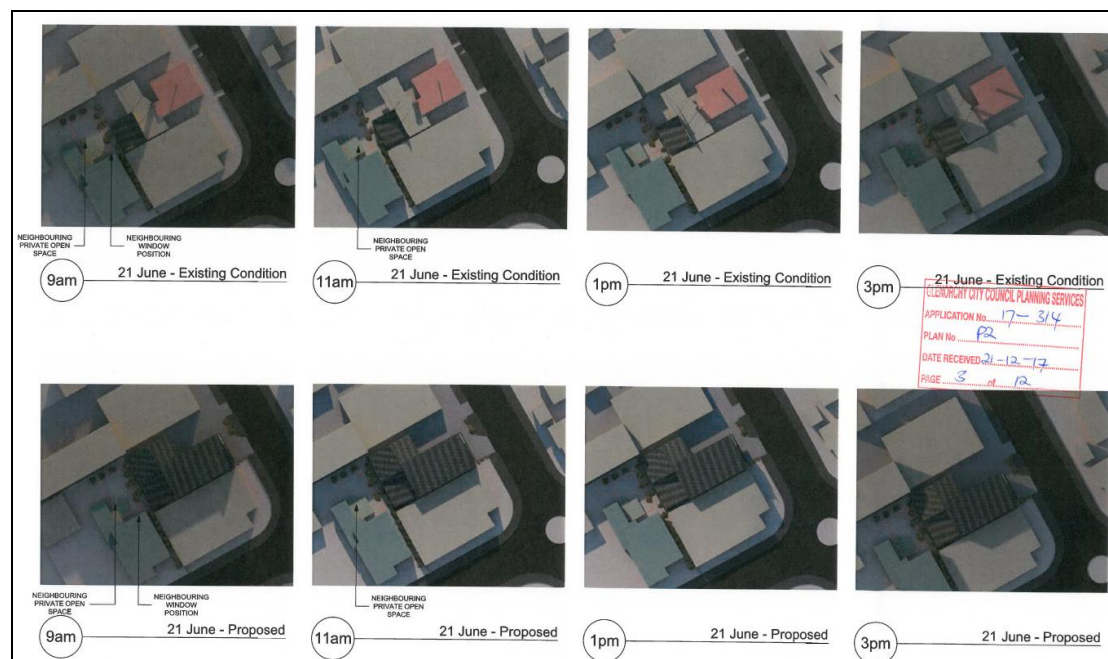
Snapshot of shadow diagram from P2 plans – planning application PLN-17-314
